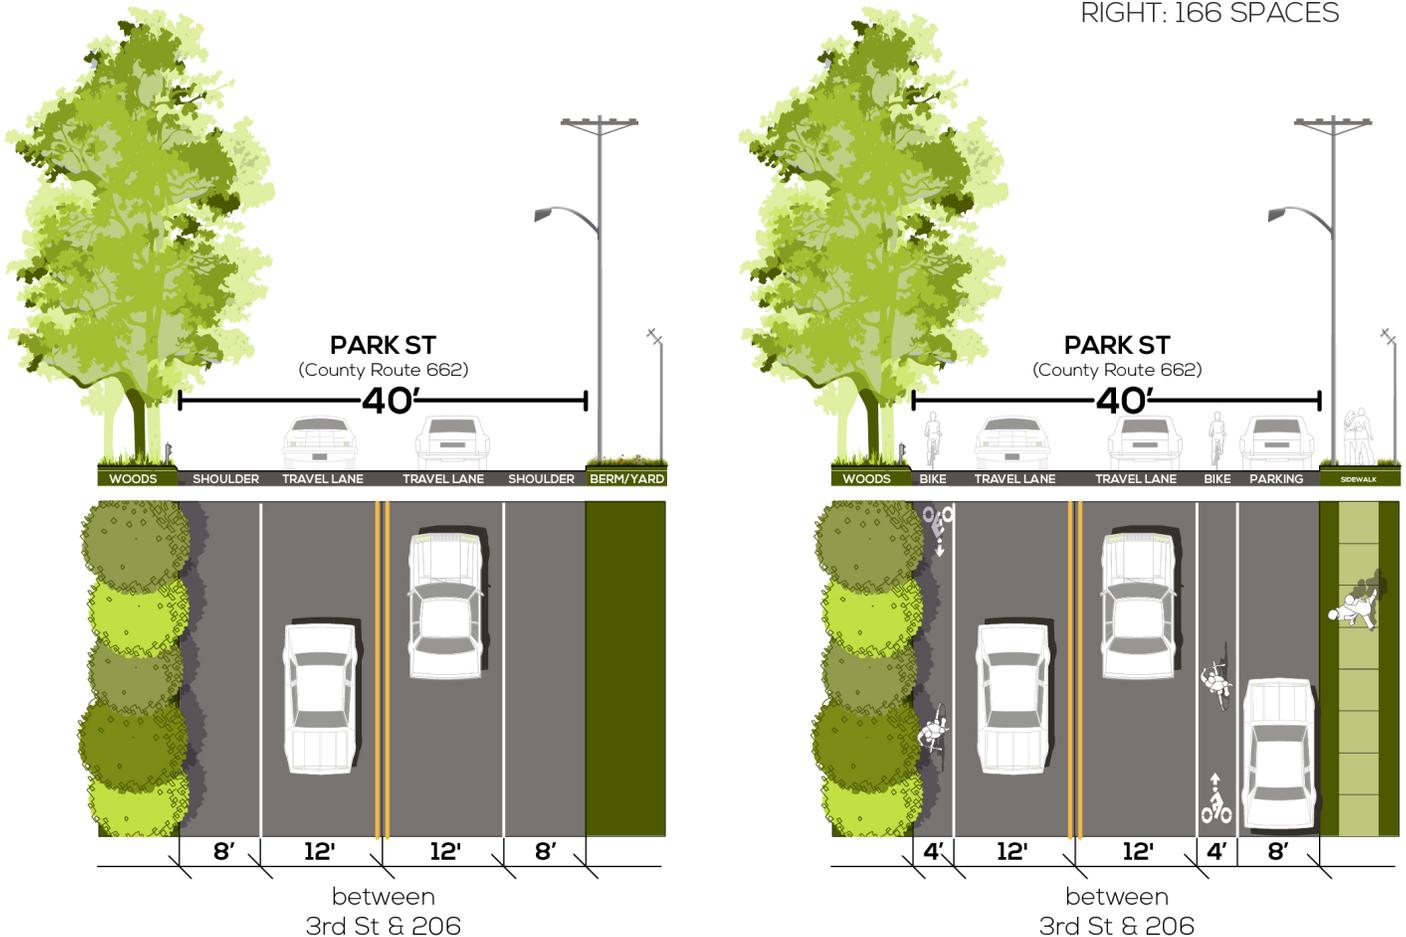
Possible Park Street Section (cycle track and one lane of on-street parking)
